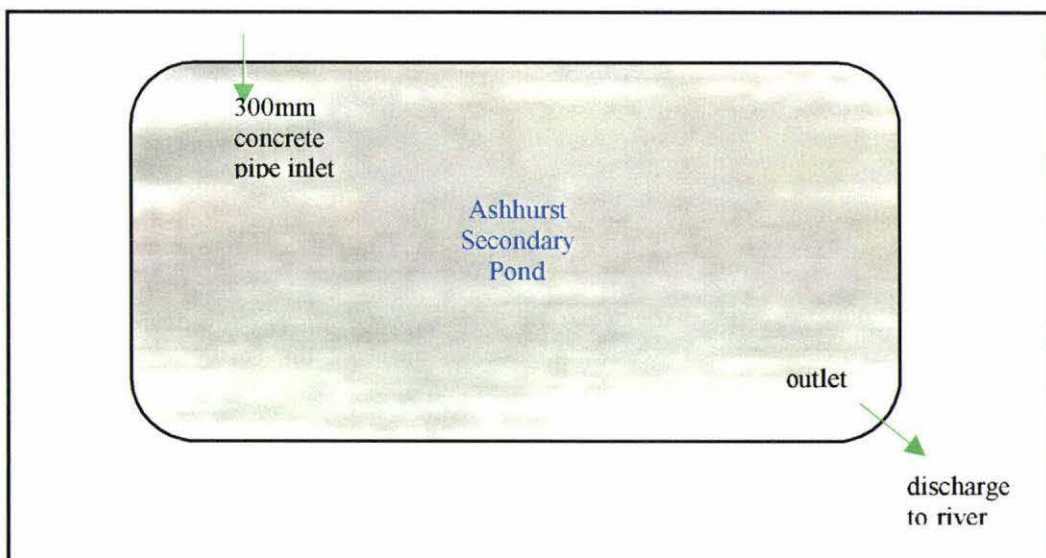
Schematic diagram of existing Ashhurst secondary pond
